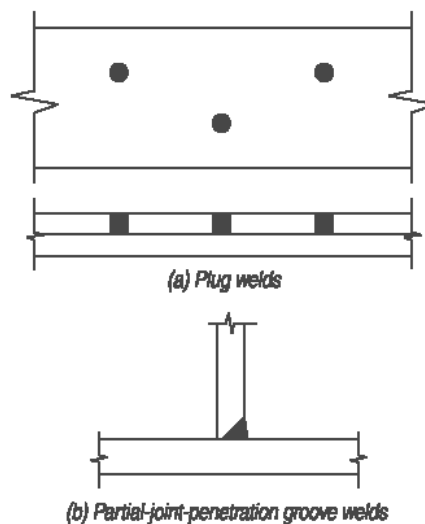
Weld element nomenclature.
